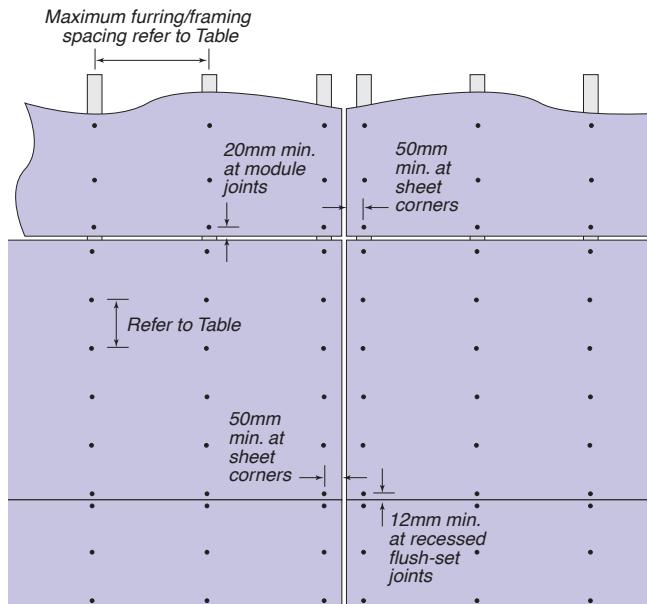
Fastener Fixing System for Interior Flush-set Ceiling Systems
